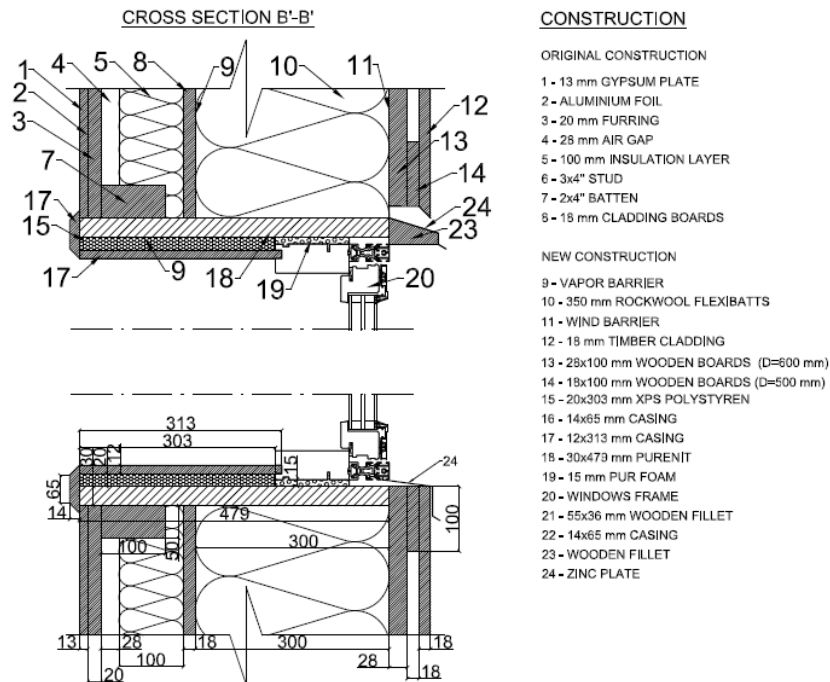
Schematic selected details of vertical cross-section of window detail including material list.
